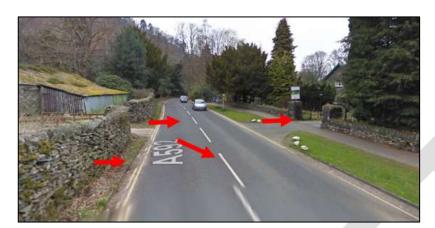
Flow route through access gate and stone wall and damage to the A592 road surface
